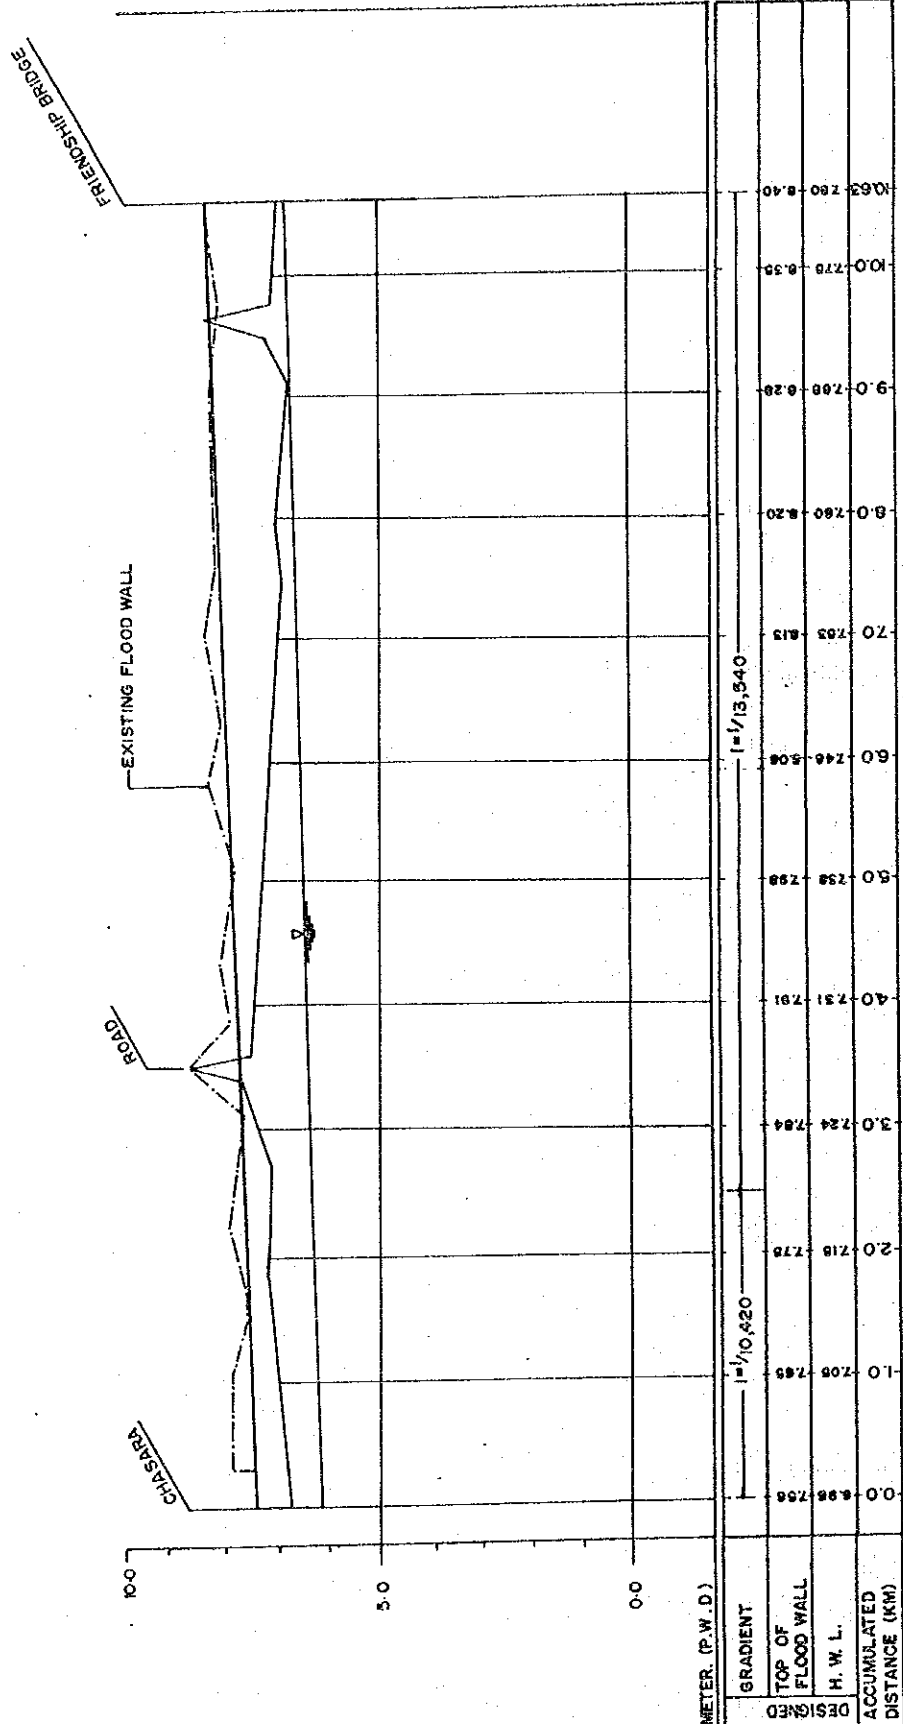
(1) LONGITUDINAL SECTION OF FLOOD WALL : DND (DW)
